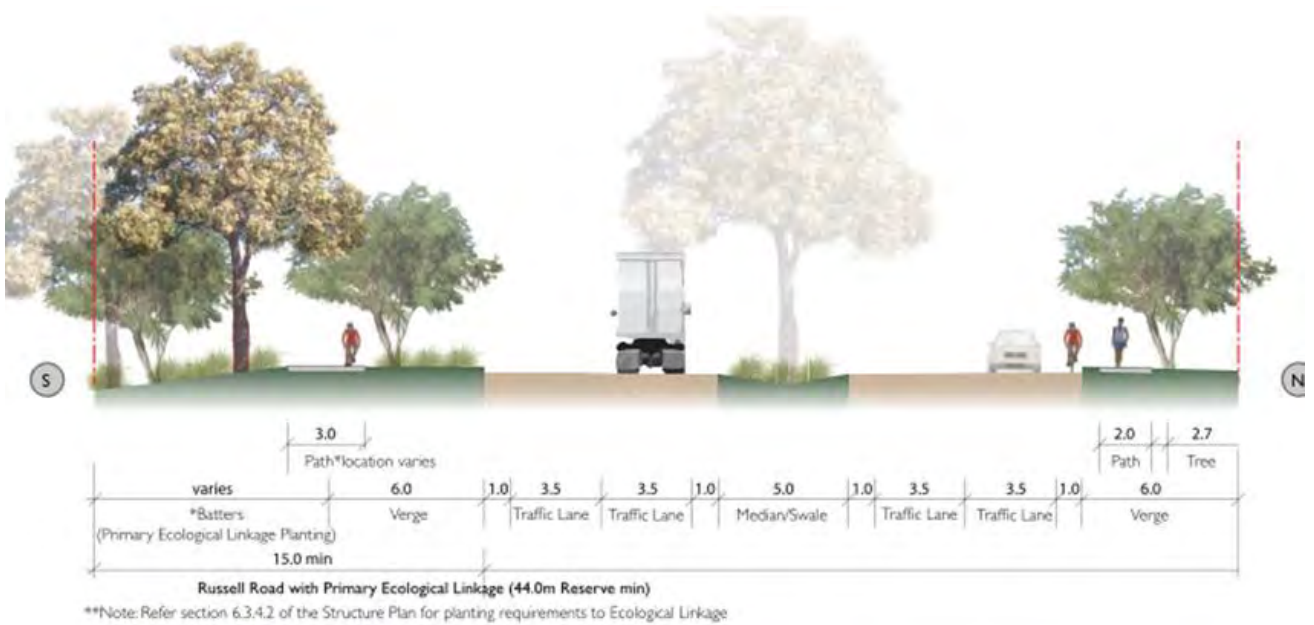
Proposed Road Reservation Width and Cross-Section for the District Distributor Road
